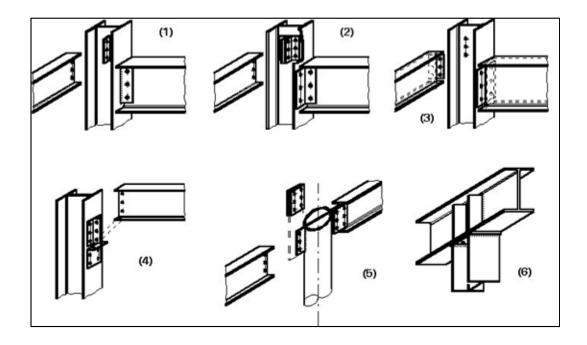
Simple beam to column connection,1) fin plates, 2) angle cleats, 3)flexible endplate welded, 4)bolted with angle cleats, 5) tube, 6) stiffness plate
